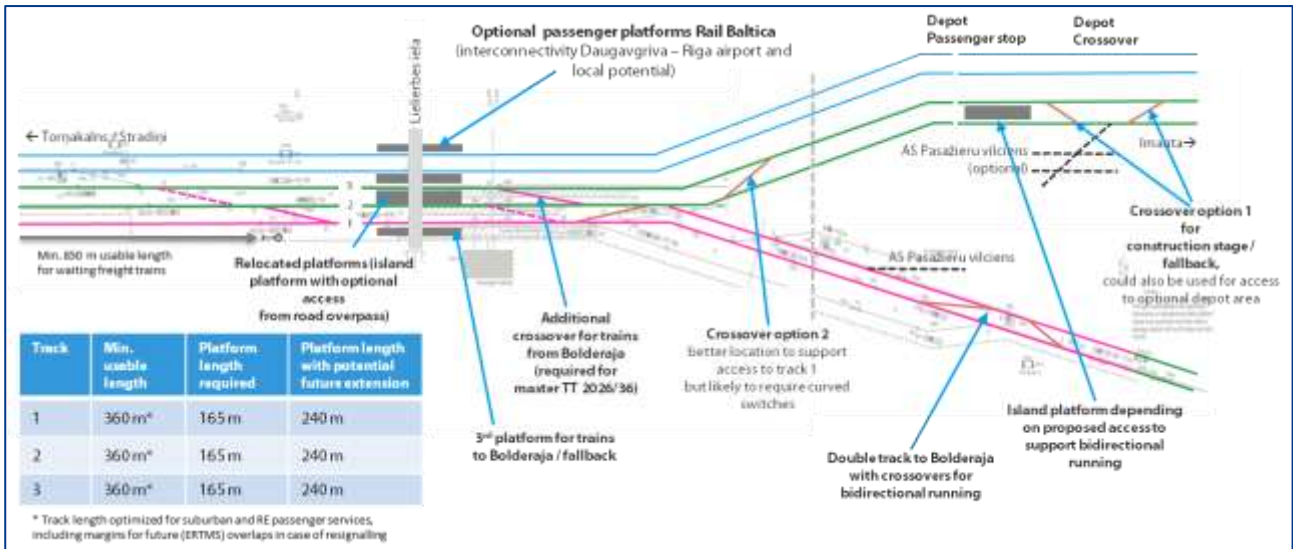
ZASULAUKS STATION - PROPOSED TRACK LAYOUT
